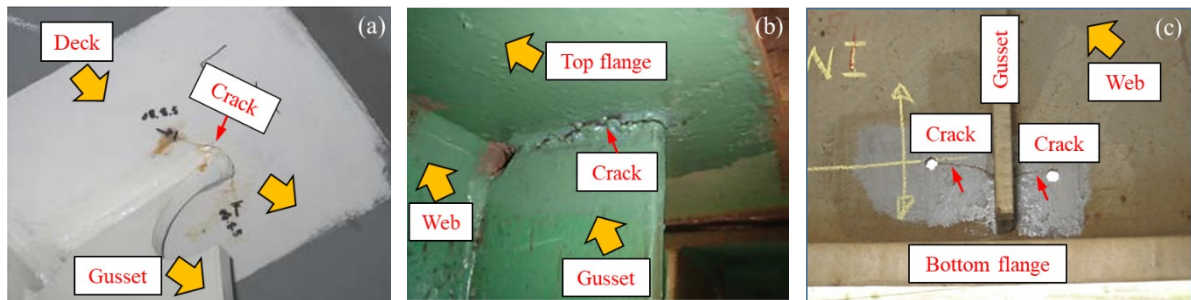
Typical fatigue cracks of out-of-plane gusset welded joints detected on the (a) bridge deck [6] (b) girder flange [7] (c) girder web [8]
